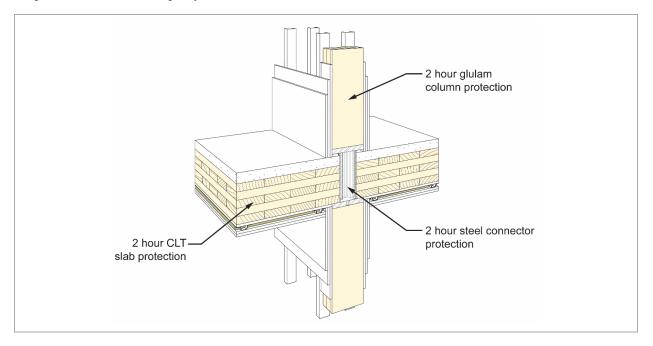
Diagram of a connection from the Brock Commons Tallwood House at UBC, fully protected by encapsulation and designed to be "fail safe" under gravity loads
